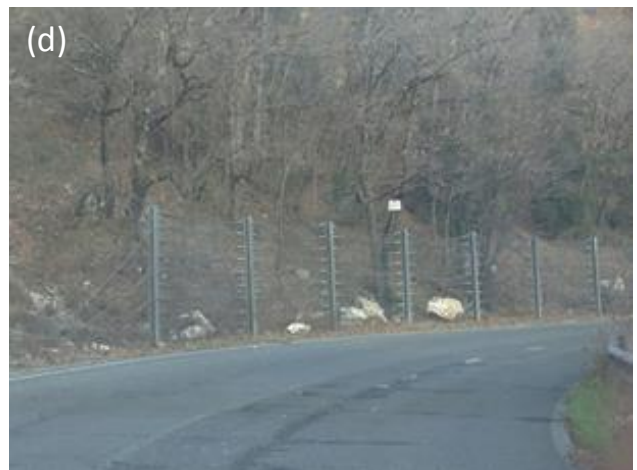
Slope protection damaged by boulders and rock-blocks.
